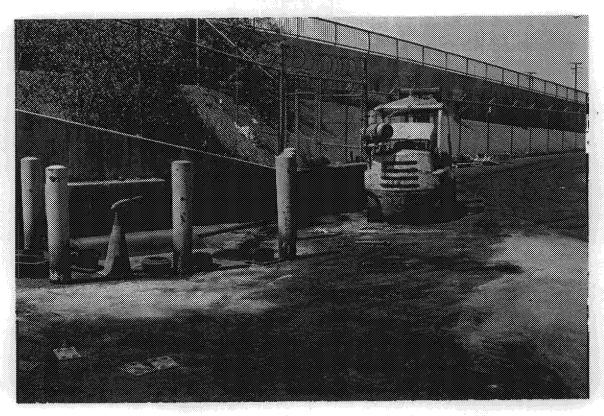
Closed Sump at Southeast Corner of 5321 Firestone Blvd.
